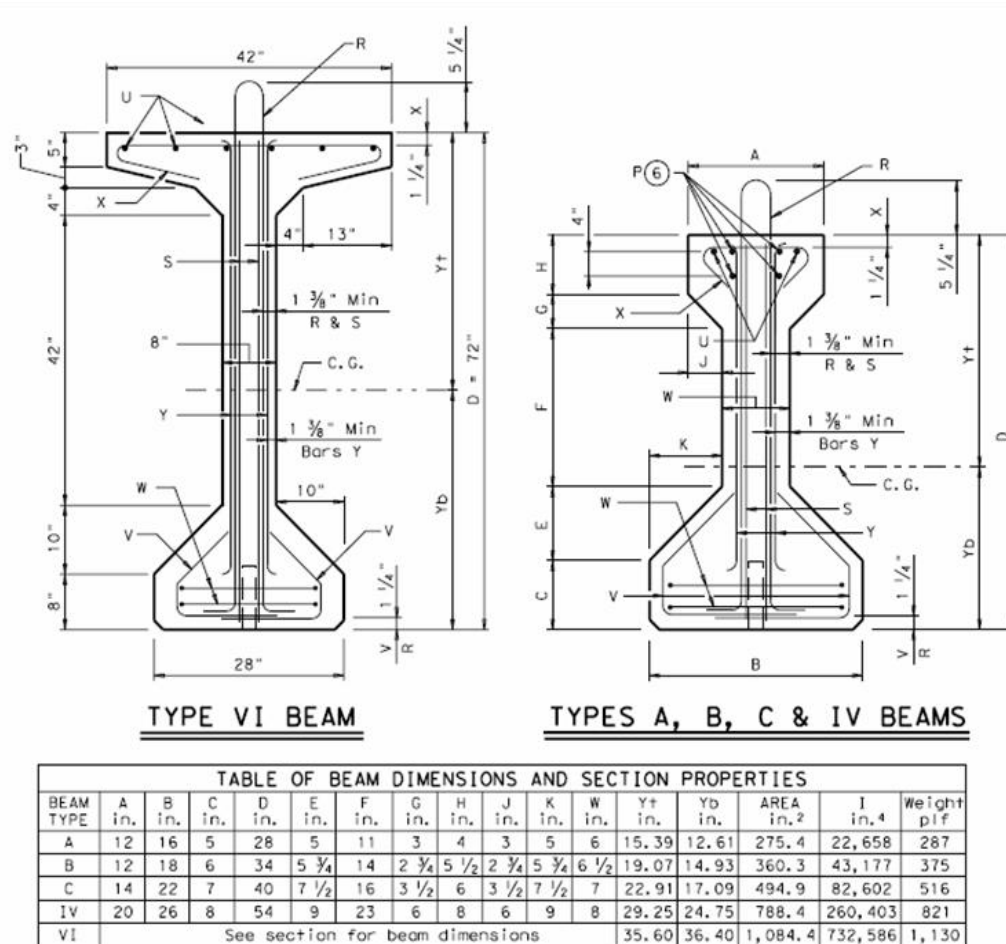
Cross Section of Typical PC Girder Dimensions (TxDOT)
